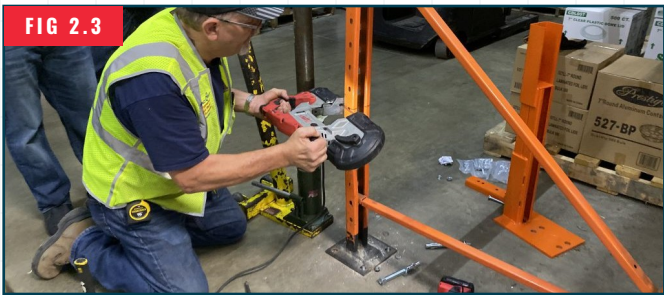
A flagged column at the base: struck, out of tolerance, and cut out for an engineered repair. The contrast with FIG 2.2 is the point.
